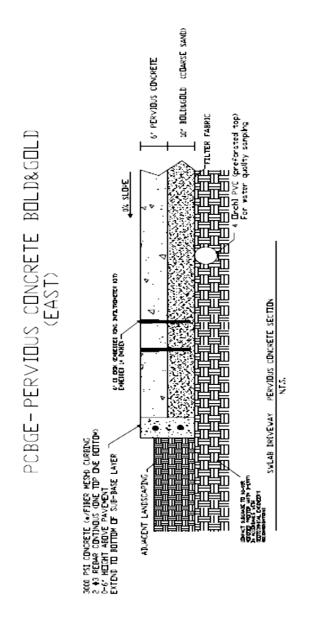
Cross-sectional view of Pervious Concrete Bold & Gold (PCBG)
